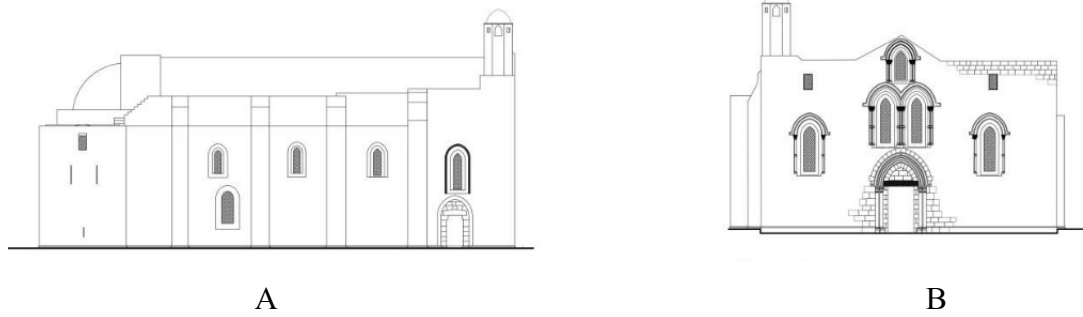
A. North façade. B. West façade, drawn by Marwān Ḥasan.
